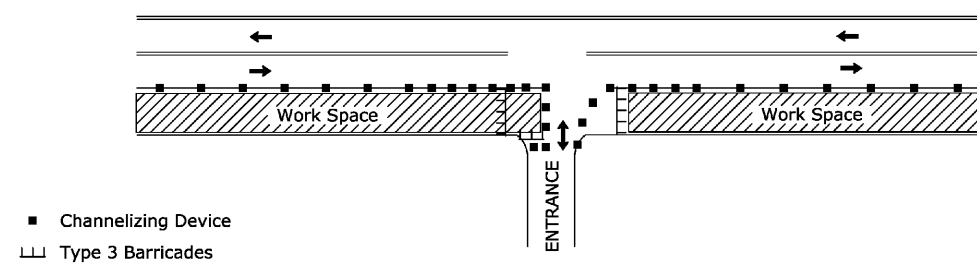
SIDE ROAD OR ENTRANCE CONSTRUCTED HALF AT A TIME: TWO WAY TRAFFIC REQUIRED
